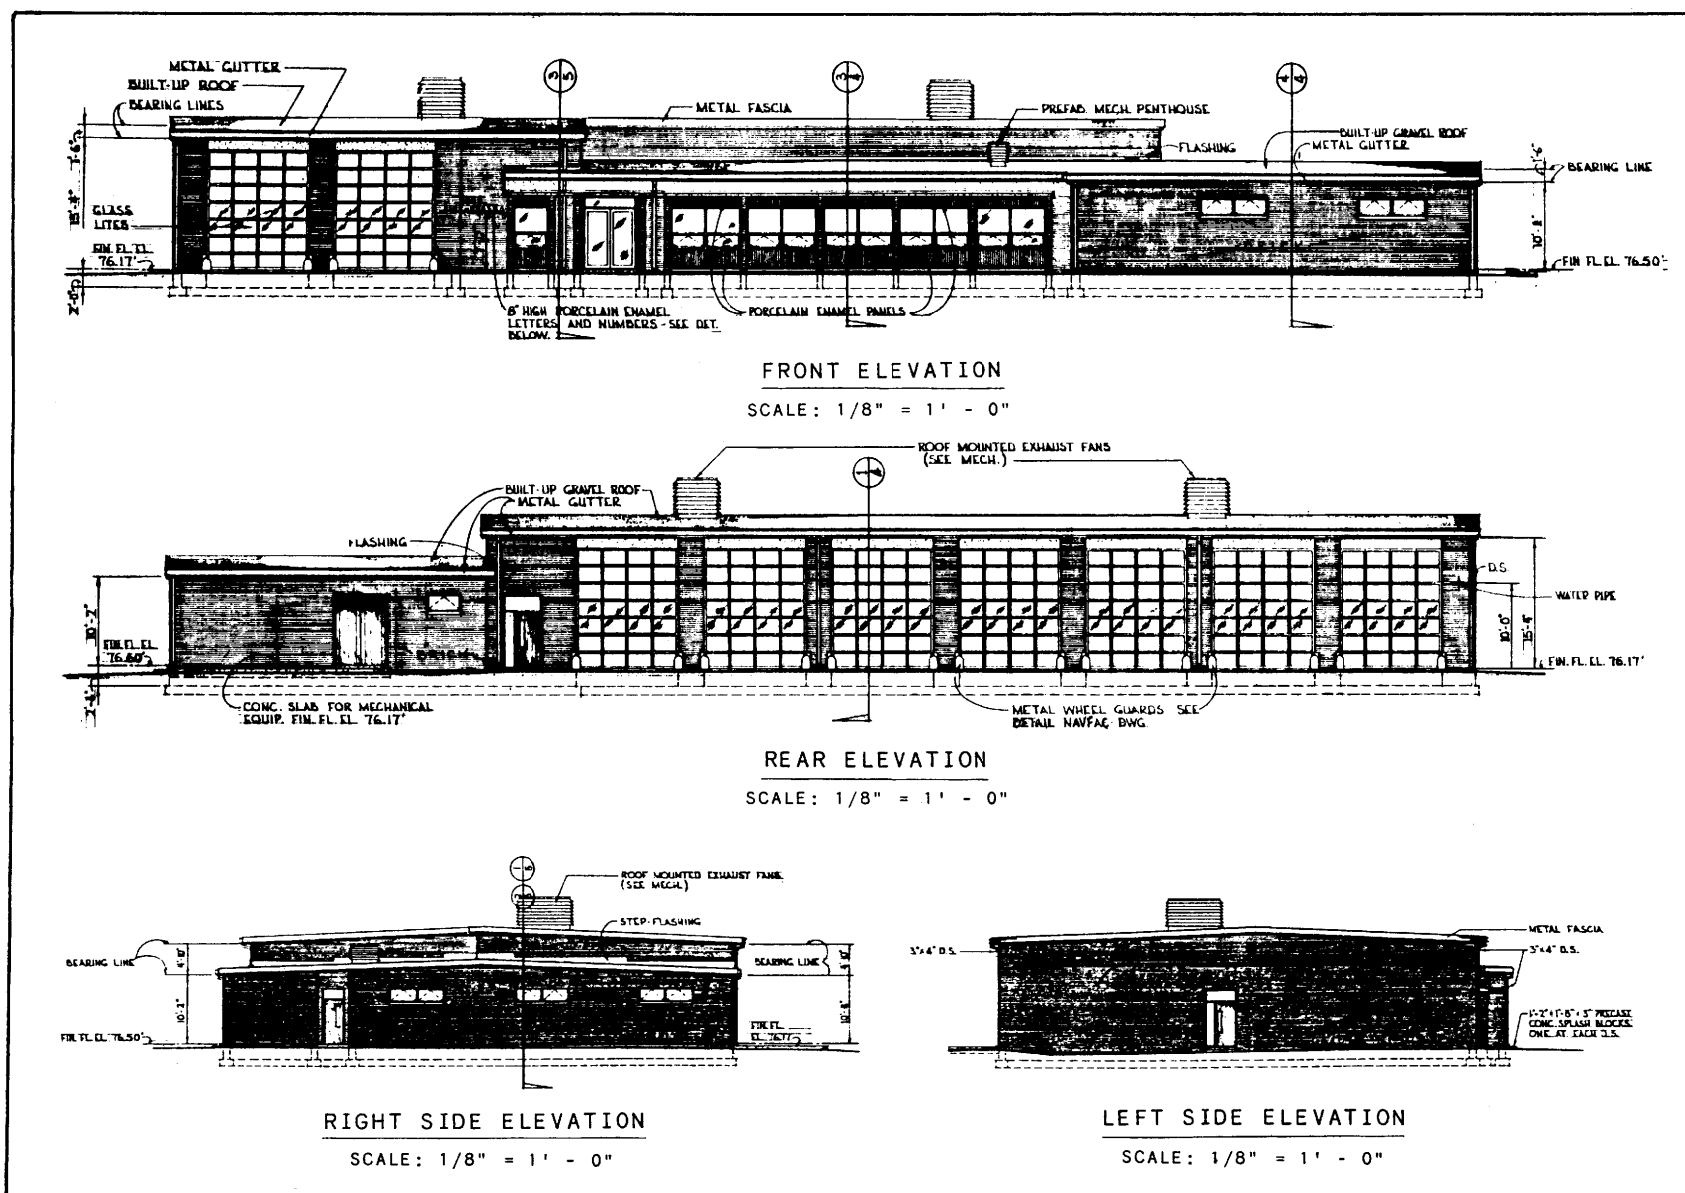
Labeling elevations for the plan shown in figure 10-14.
